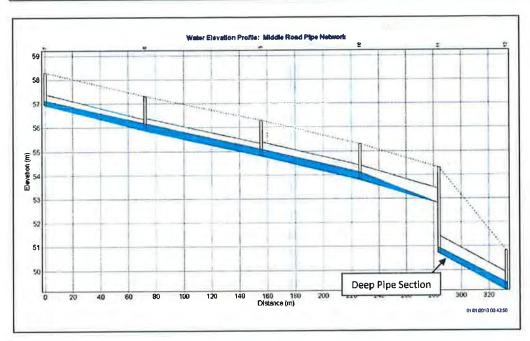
Long Section Plot – Conceptual Network 1 (section parallel to Bradford Road)
